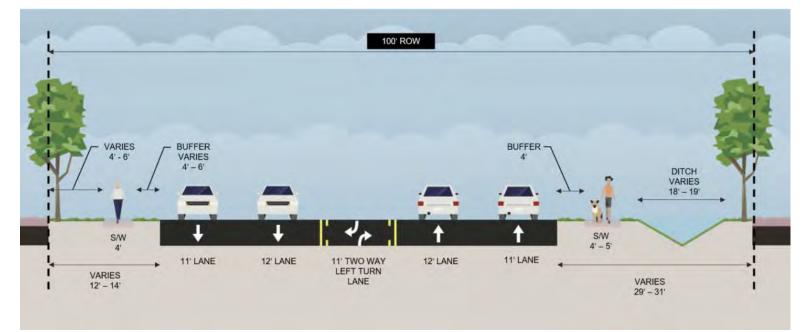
A Existing Typical Section: Memorial Drive – Tallowood Rd to Paul Revere Dr N.T.S.
